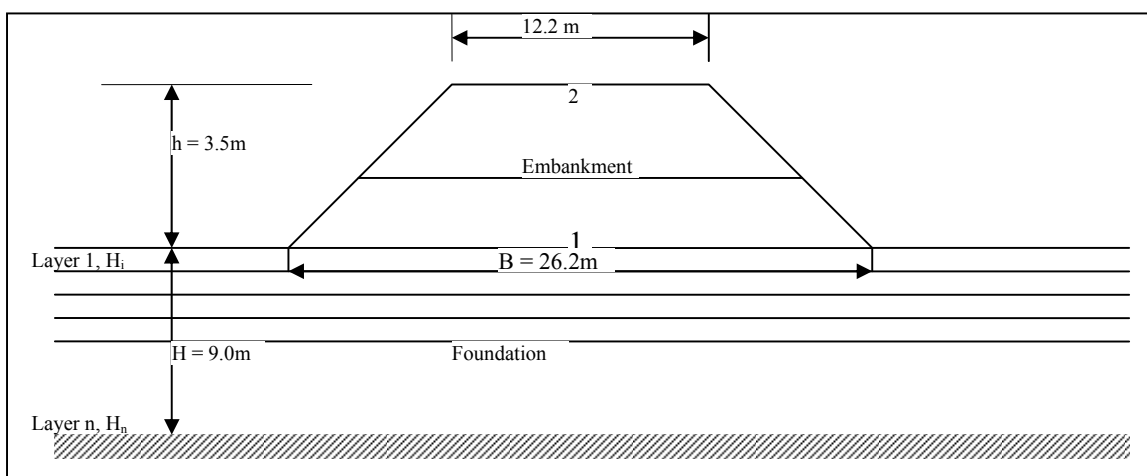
Embankment geometry and foundation layers assumed for the analyses
